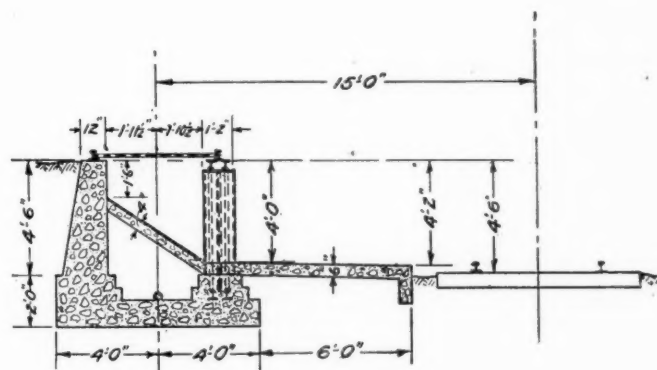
A Dry Pit Built by the Bangor & Aroostook
